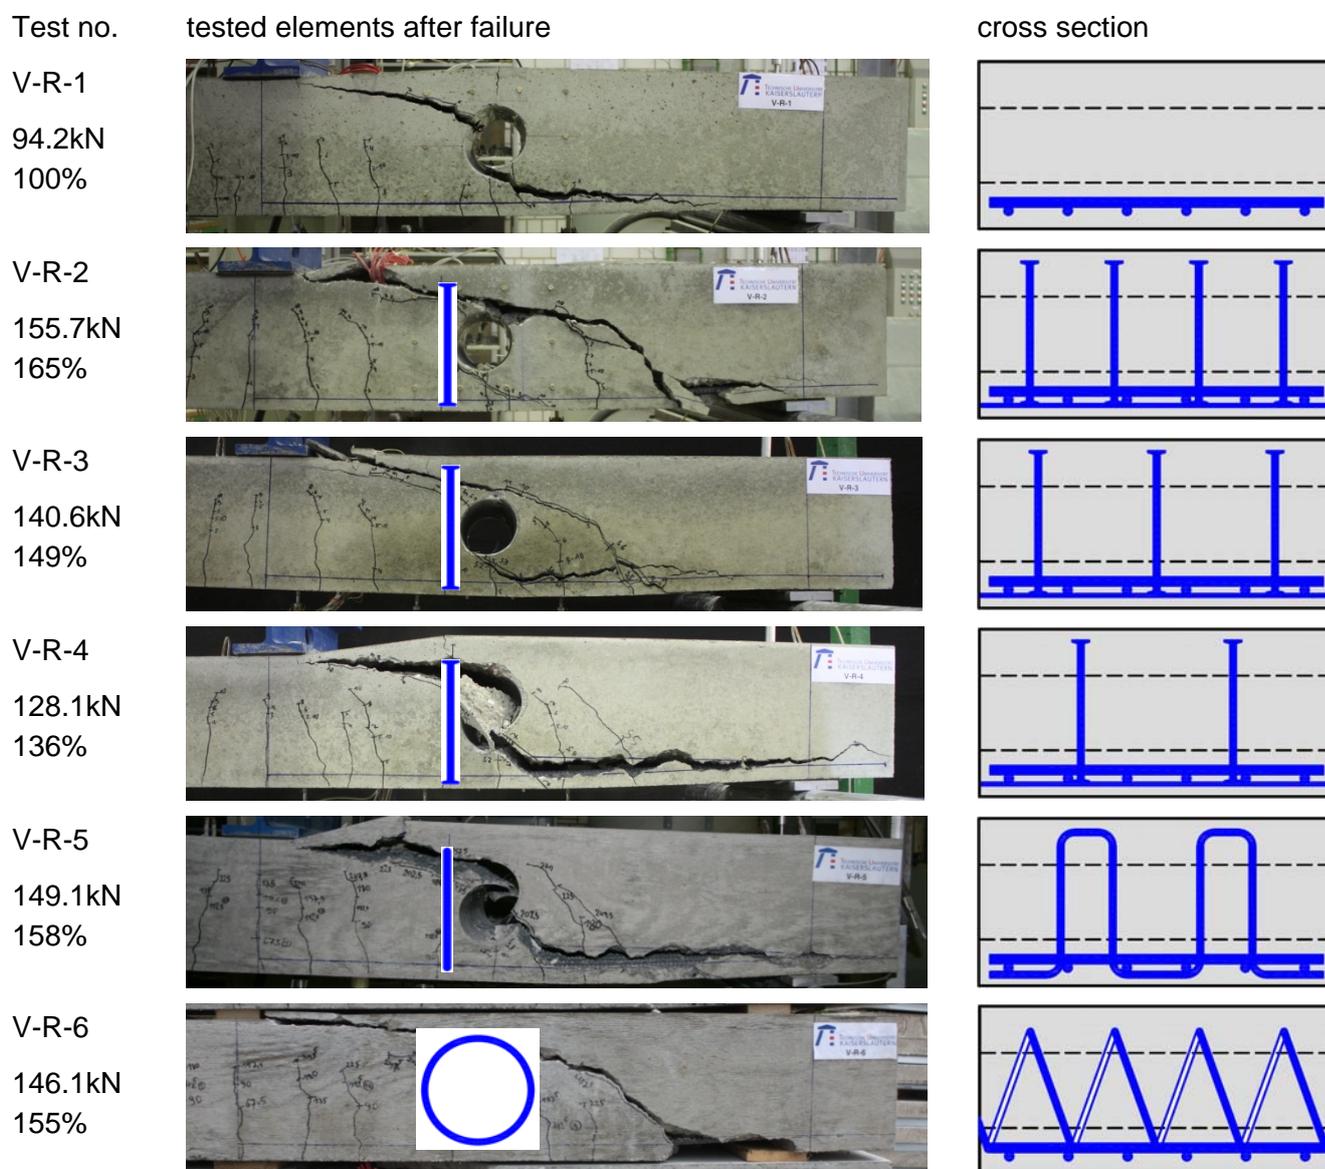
ultimate shear force and modes of failure at building elements with single circular ducts
